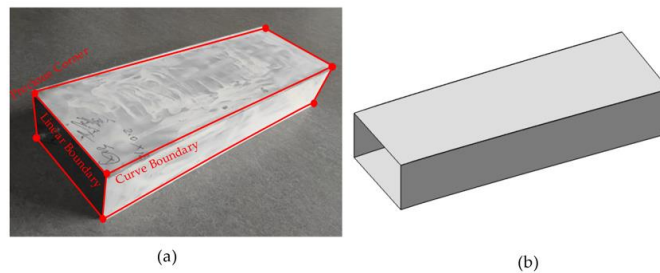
(a) End nodes of a box girder (b) BIM model of reverse generated steel box girder
